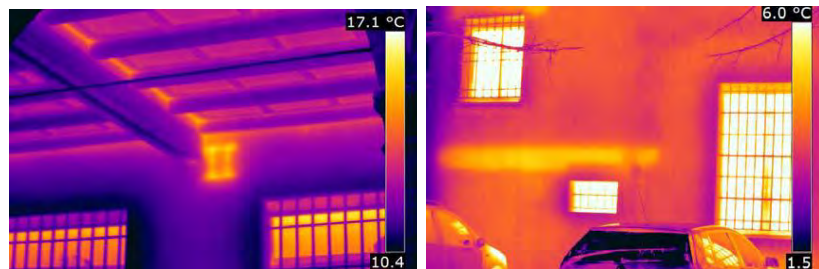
\_ Post-refurbishment NDT of thermal bridges by IR thermography: steel beam-ends (left); concrete stairs landing (right).
